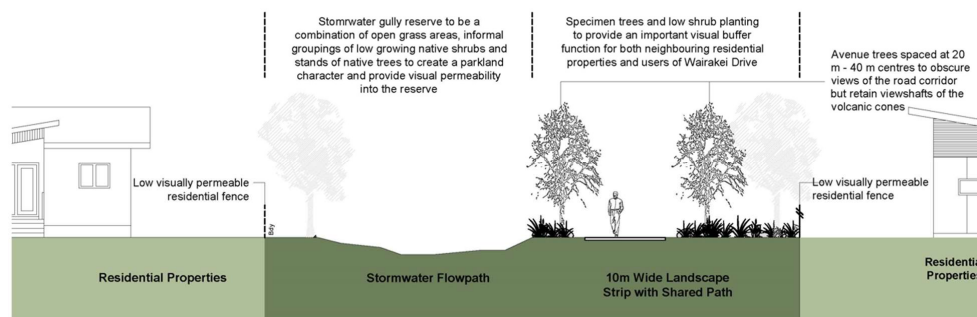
B: Cross section illustrating the Stormwater Reserve frontage
